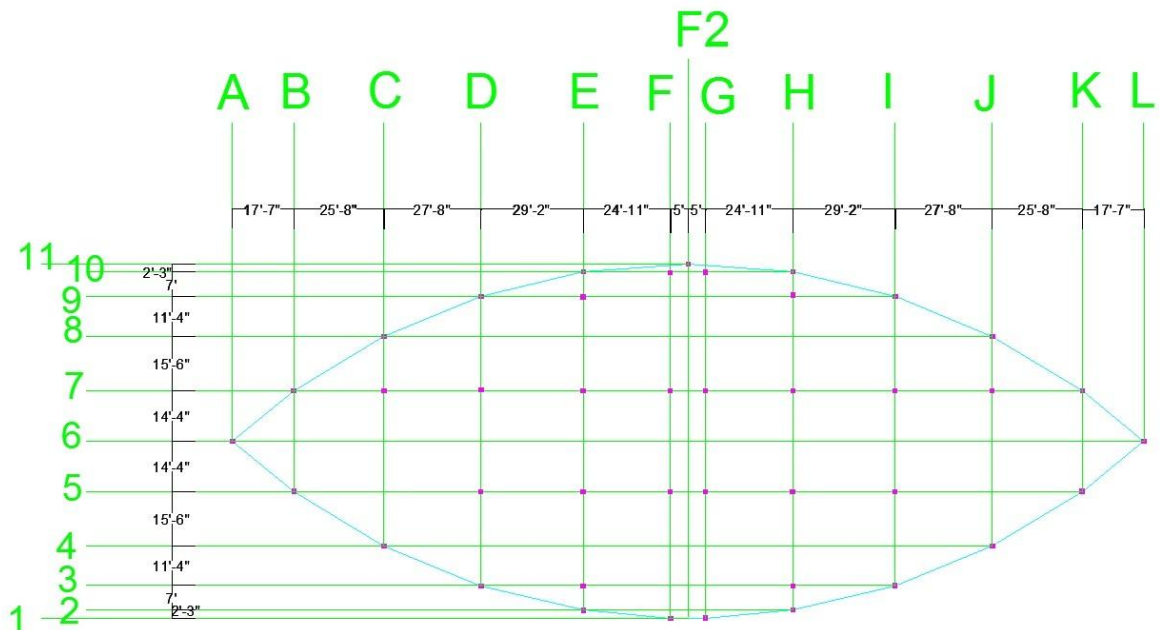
NEW COLUMN LAYOUT W/O FLOOR PLAN
